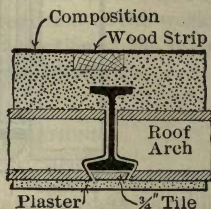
Roof Beam Protection, Maryland Trust Building, Baltimore Fire.
